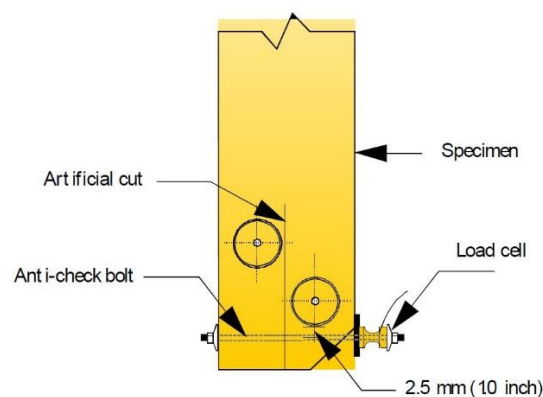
Anti-check bolt as reinforcement for split ring connection (Quenneville and Mohammad, 2000).
